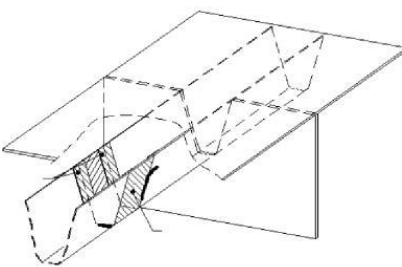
Type 1: connecting element in trough element (Dooren, F. van)
